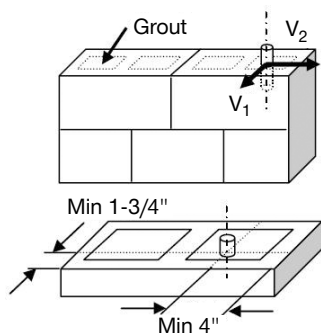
Hilti KWIK Bolt 3 installed in the top of masonry walls
